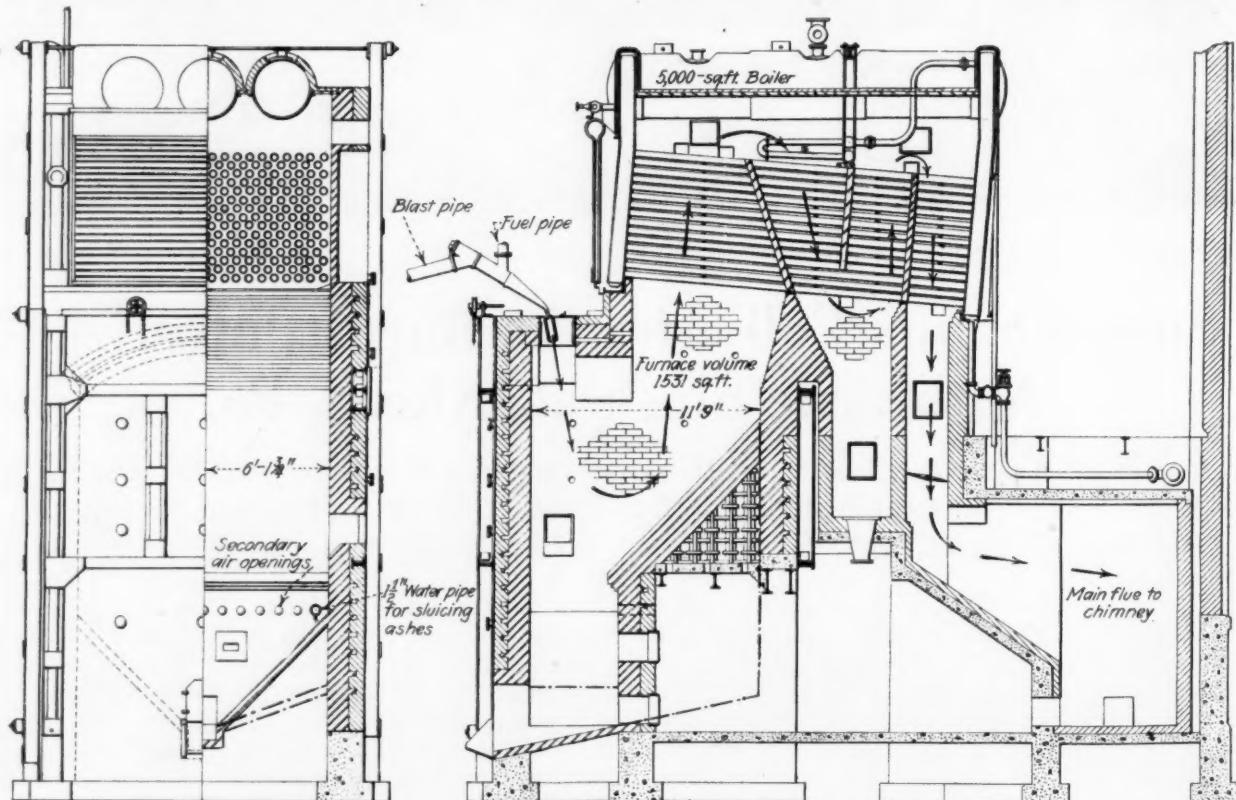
Cross-Sectional View of Boiler, Furnace and Setting
